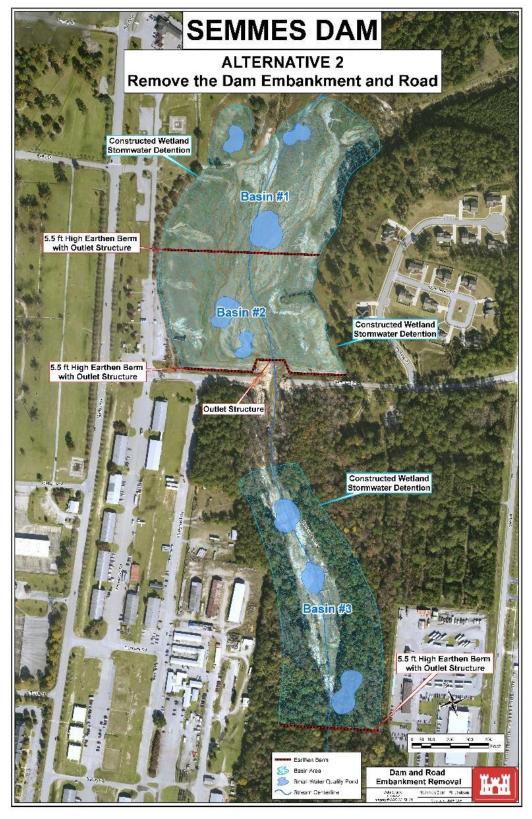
Alternative 2 Remove Dam Embankment and Road; Provide Stormwater Detention (Conceptual Design)
